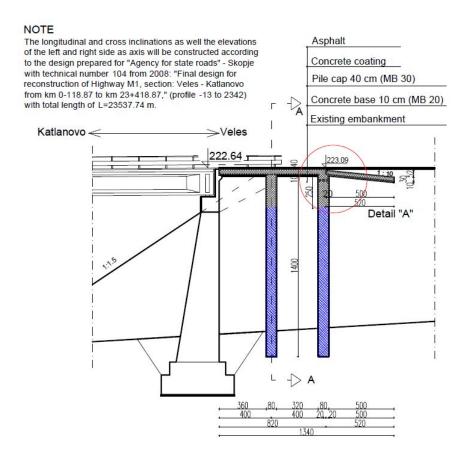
Longitudinal section of abutment S-2 with piles and pile cap (RS1)
